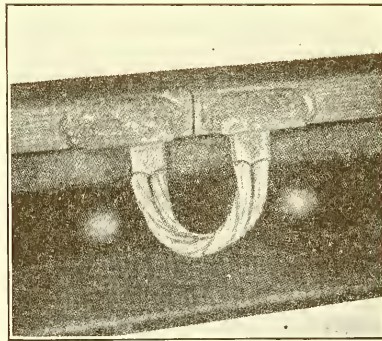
Electric Rails and Welded on Bond.
